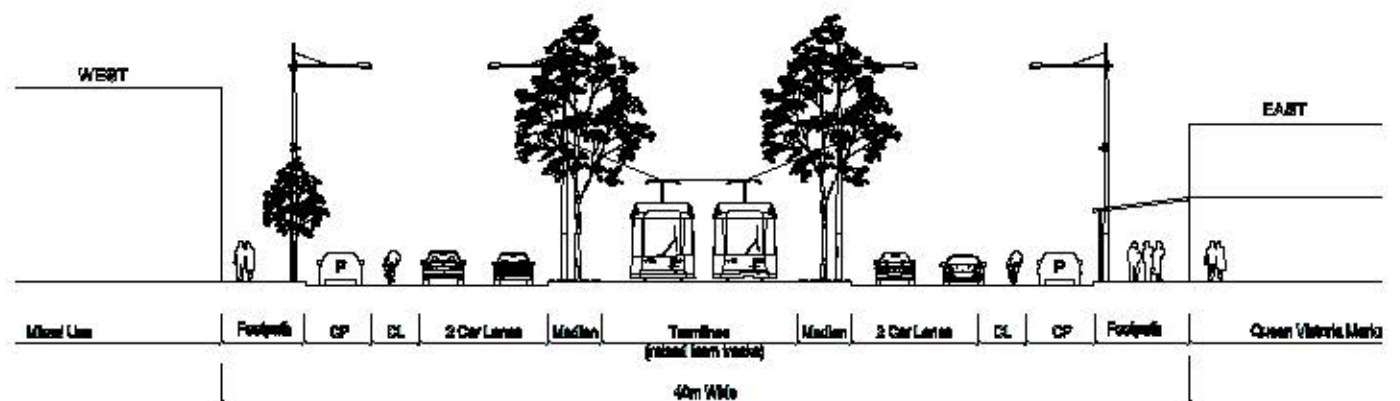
Indicative Peel Street section between Dudley Street and Victoria Street looking north.
